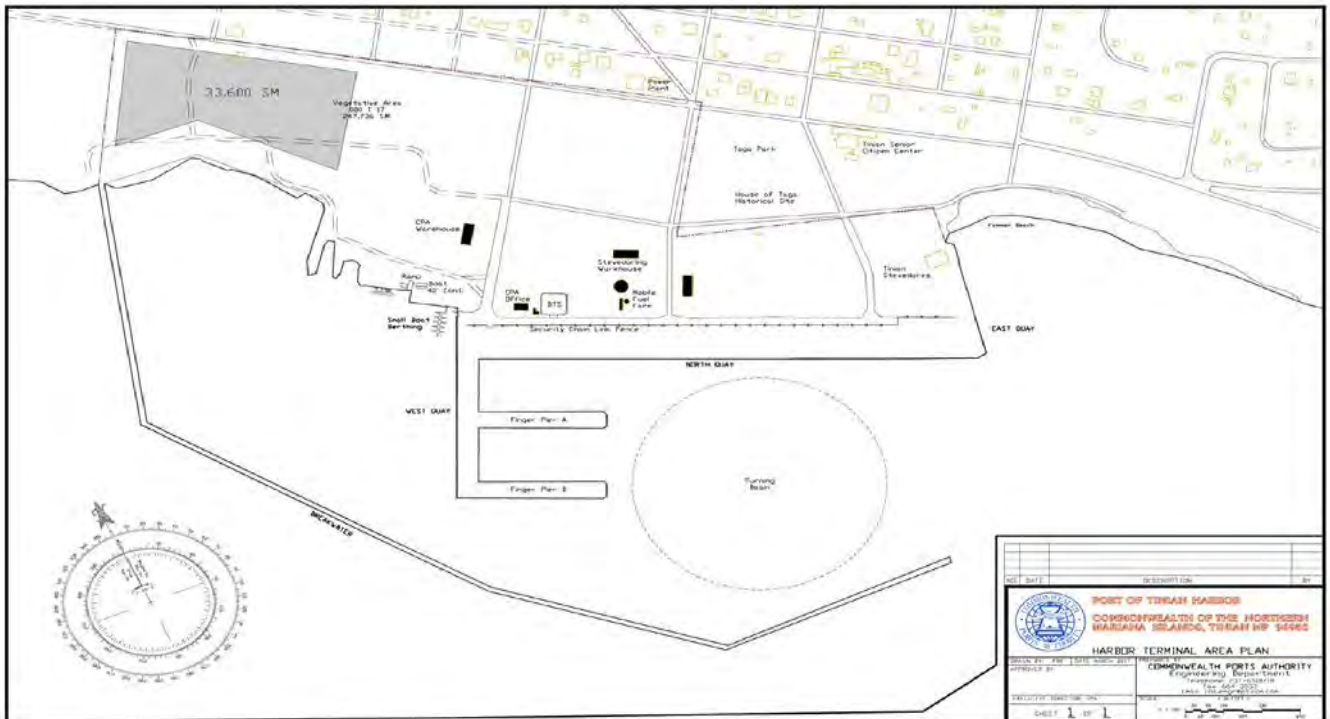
Plan view layout for Temporary Work Area (Approx. 8.3 acres)
